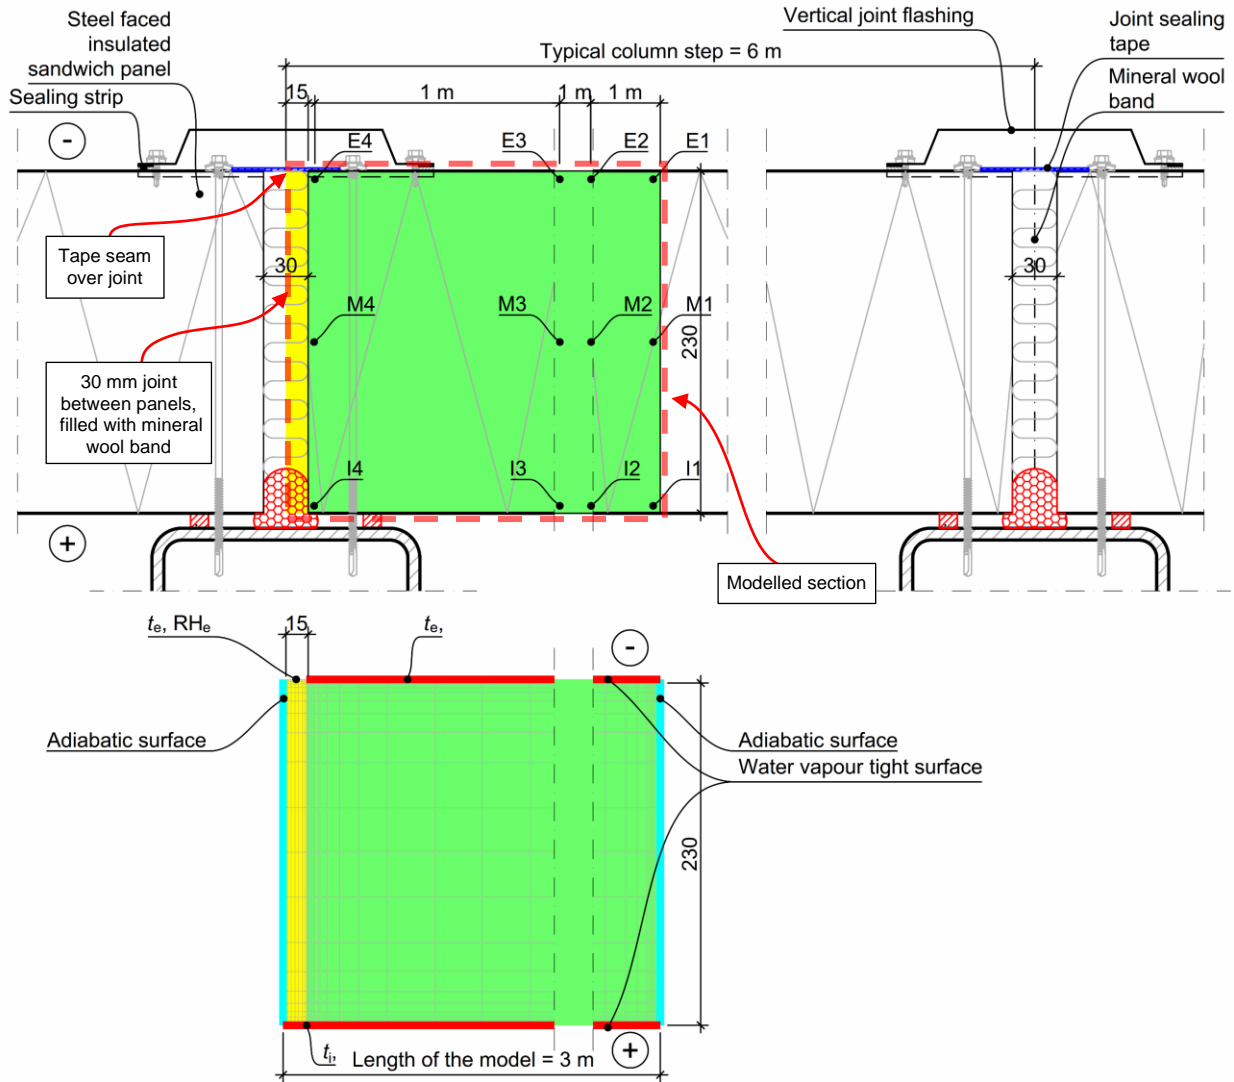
Horizontal section of a typical external wall constructed with steel faced insulated sandwich panels (above) and the simulation model (below).
